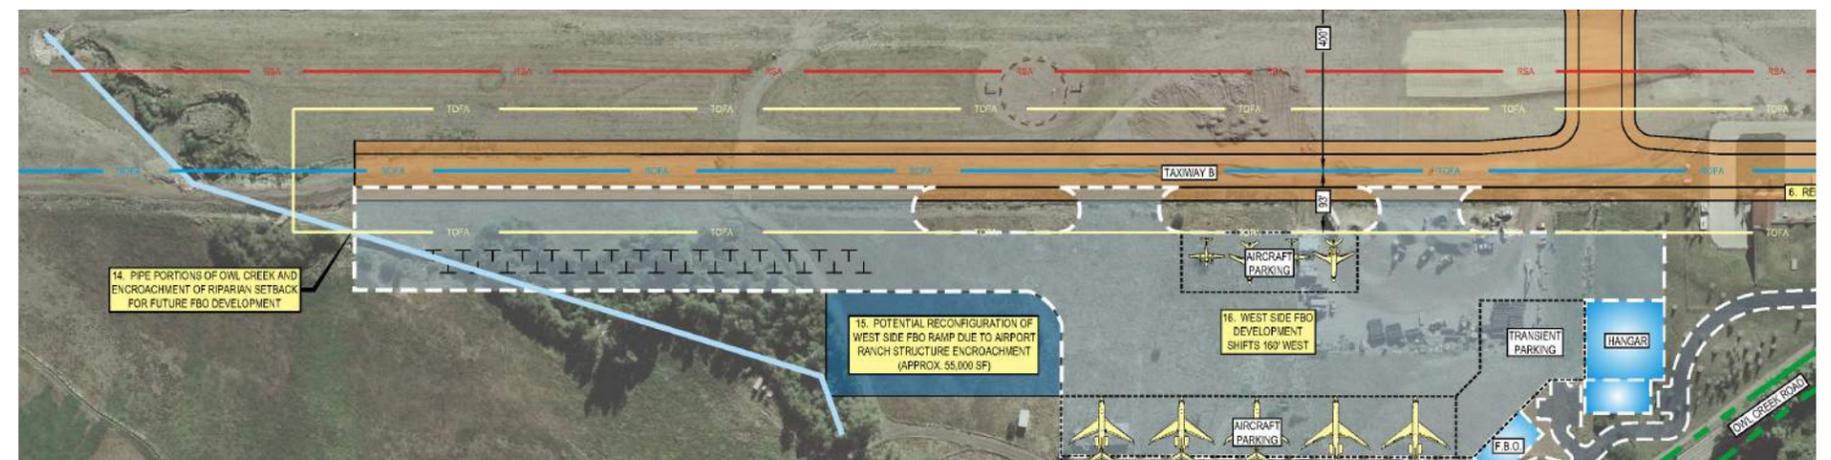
95-Foot Wingspan Aircraft on Master Plan Commercial Ramp (Appendix C, Alternative 1, Sheet 2 of 5)
